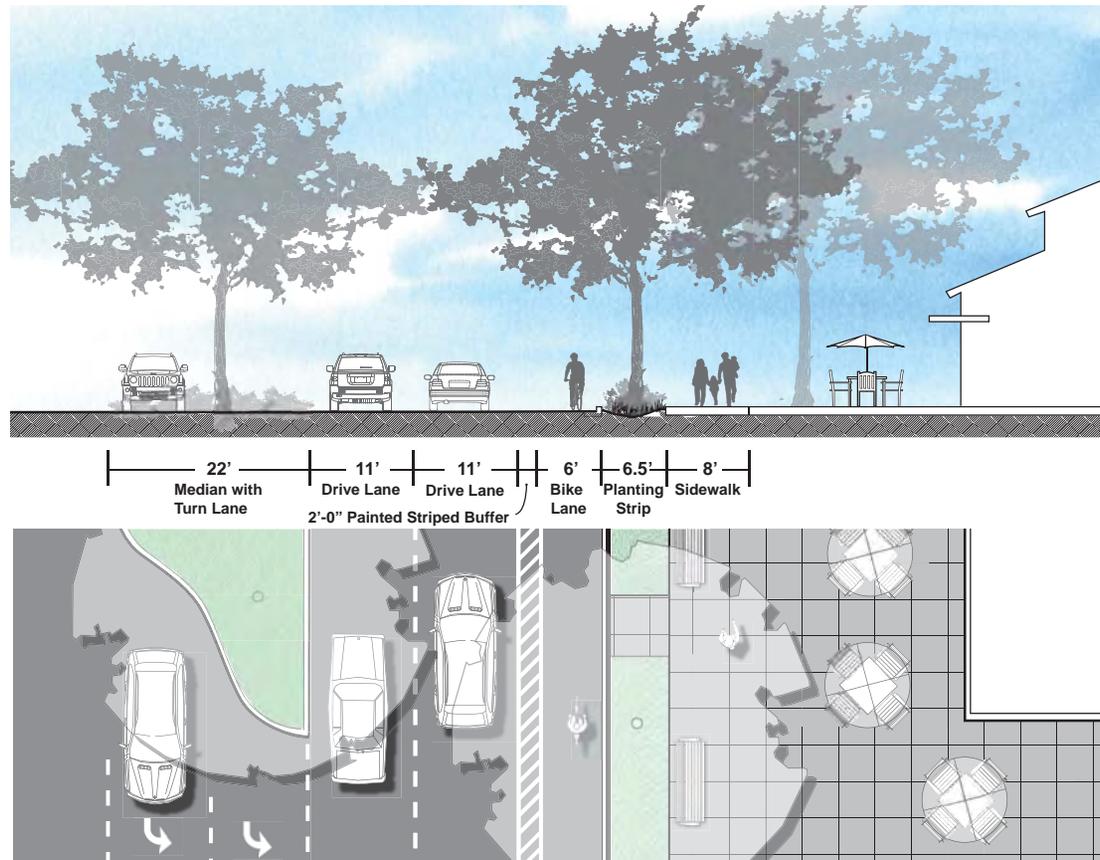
Section 4: Los Gatos Boulevard south of Neighborhood Street future alignment. Note: Sidewalks which extend outside of right-of-way will require an easement.
